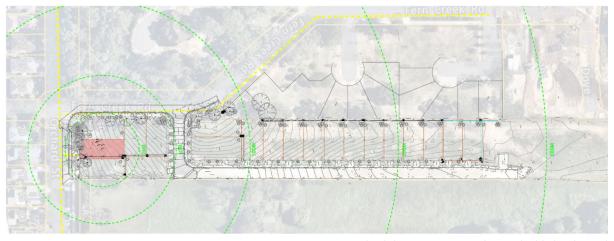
Approved Subdivision Layout with Lot 2 highlighted in red Source: PTI Architecture
